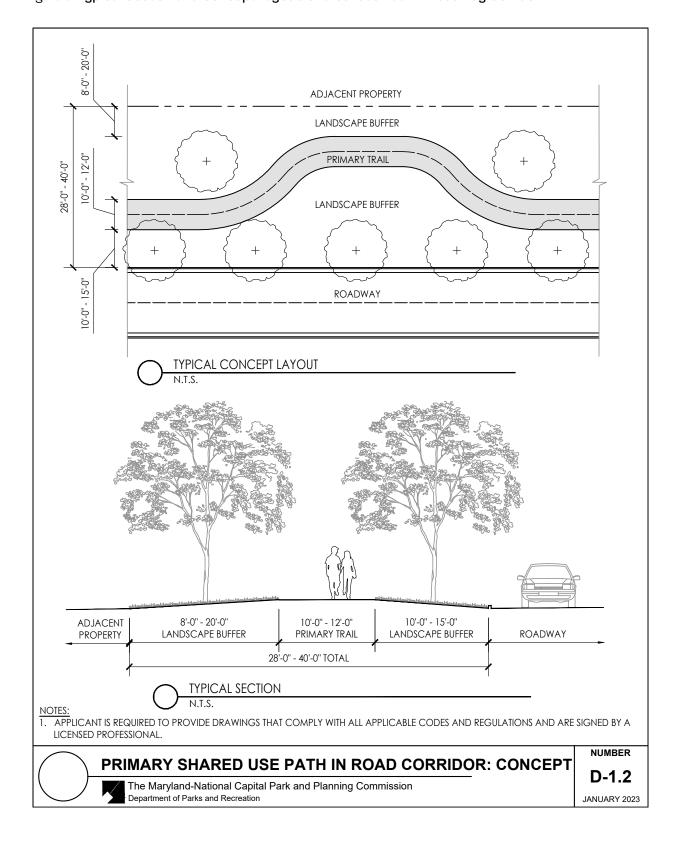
Typical Section and Concept Layout: Shared-Use Path in Roadway Corridor
